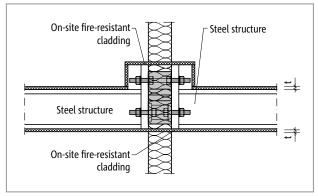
Fire protection Schöck Isokorb® T type S: On-site fire protection cladding for overlaying face plates; section
